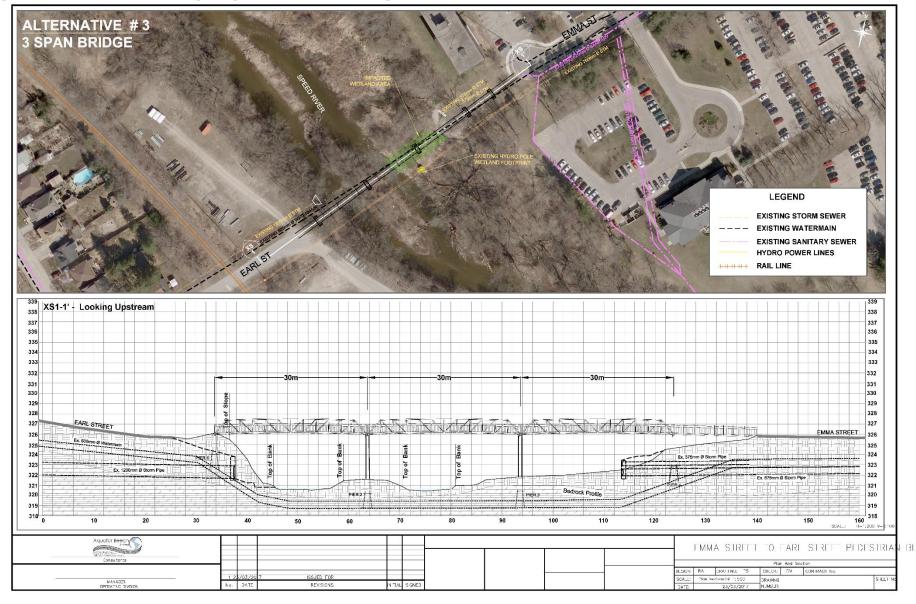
Alternative 3: Triple Span Steel Truss Bridge.
